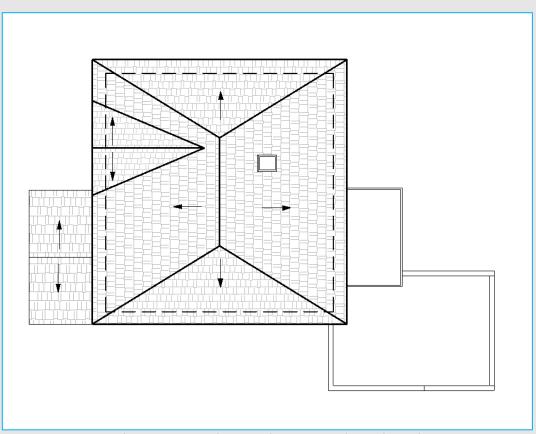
Roof Plan Deliverable as Viewed in Revit
